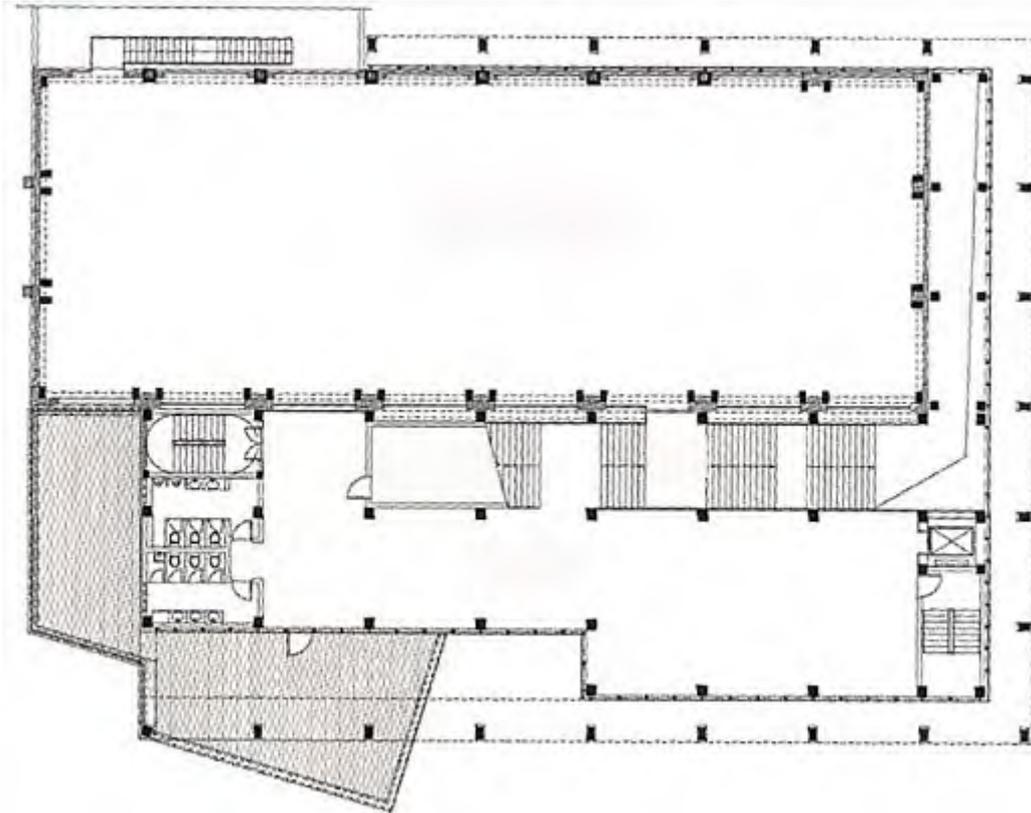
The 2nd floor of 4# building (Source: Chongxin ZHAO, “Reconstructing of 1933 Old Mill,” Architectural Creation, 2008, 50–56)
